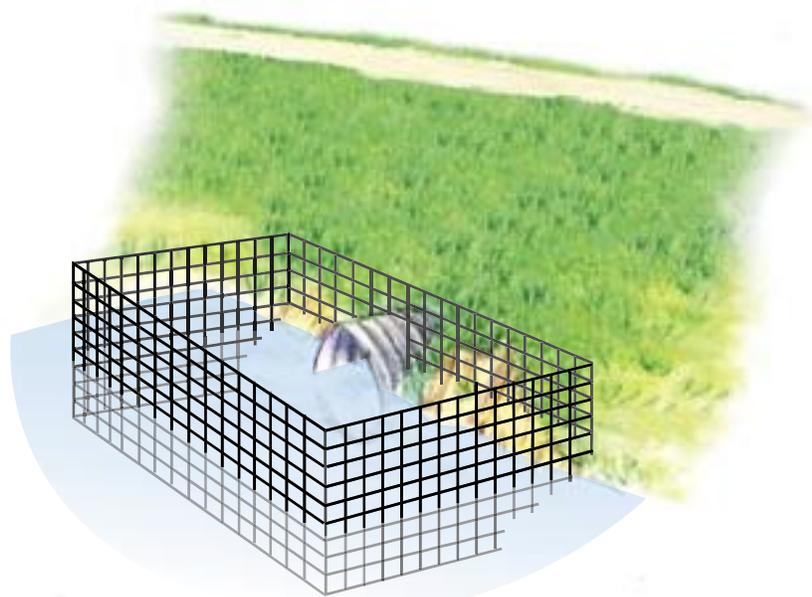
Install fencing around culverts and outlets to prevent beavers from blocking flow.
